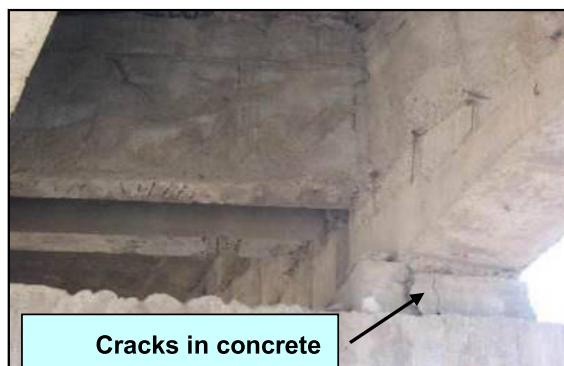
Cracks in Bearing Pedestal and Concrete Spalling in Pedestal
